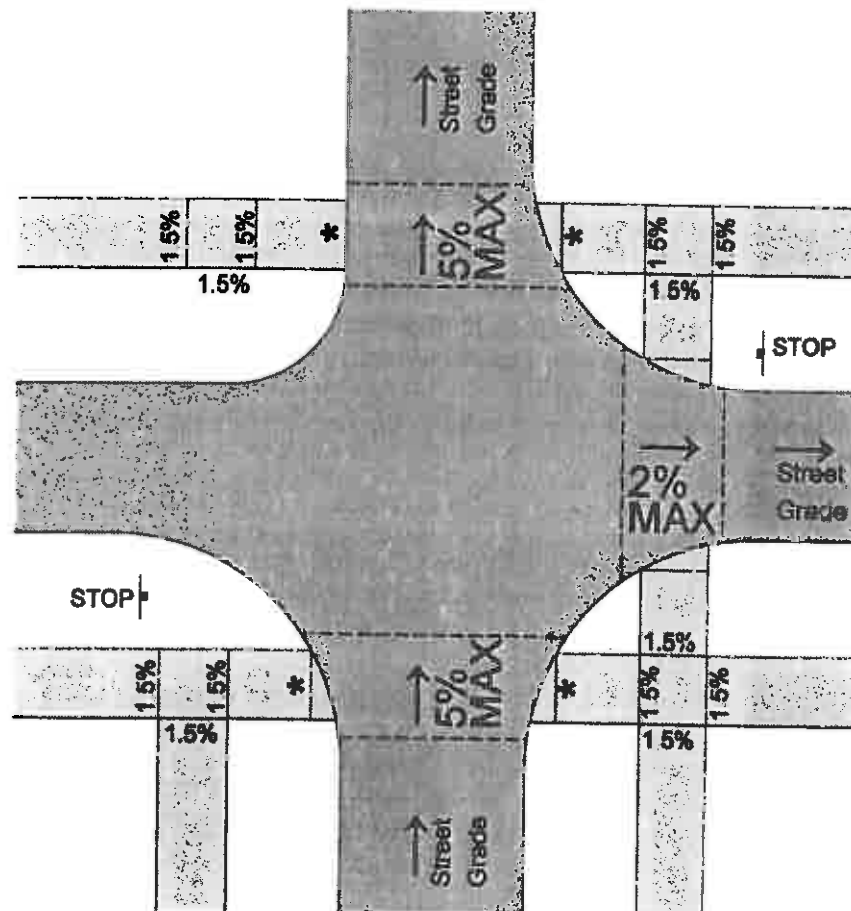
A-2.03: Standard Sidewalk and Curb Ramp Elements
